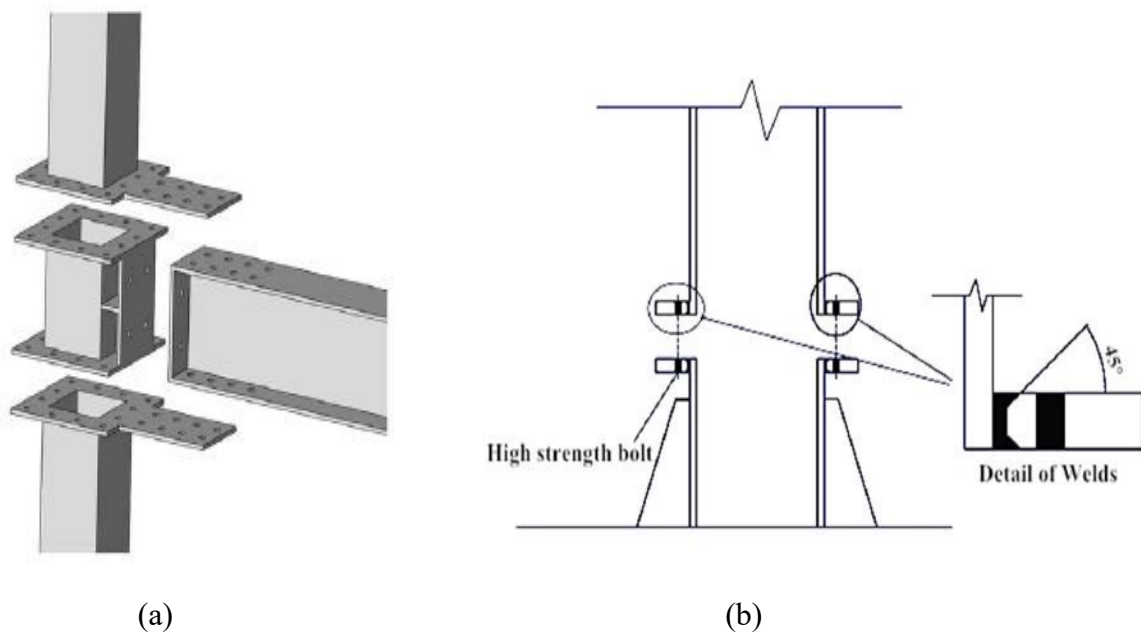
a) H-section beam to HSS column connection (Liu et al. 2017), b) column-to-column bolted-flange connection (Liu et al. 2018)
